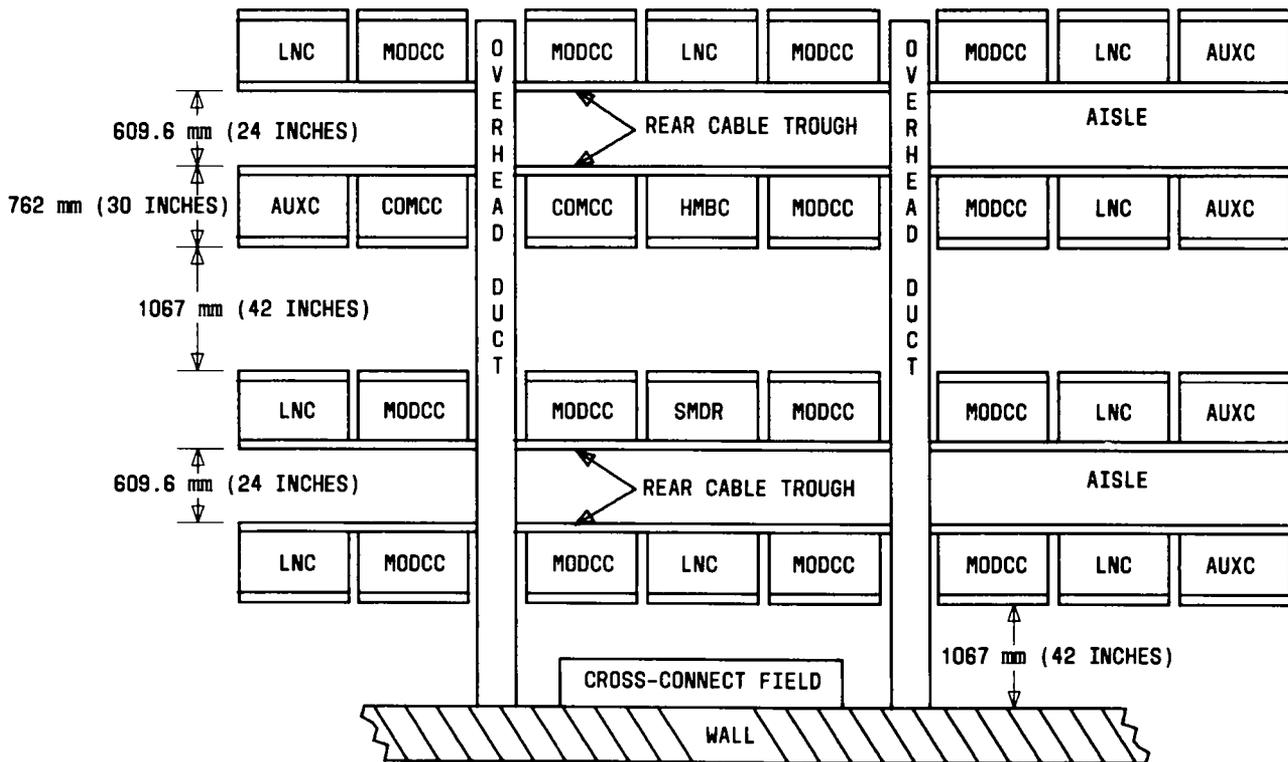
Typical High Density Floor Plan—DIMENSION Custom PBX (7-Module)
